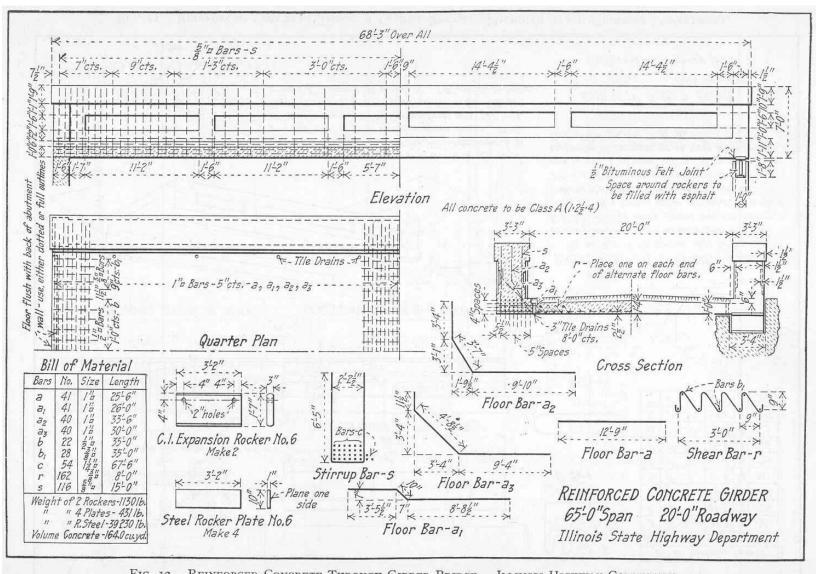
Reinforced Concrete Through Girder Bridge, Illinois Highway Commission.
